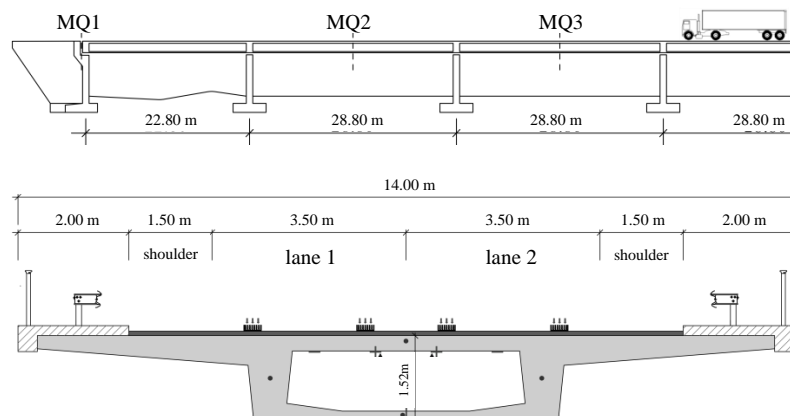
Bridge structure longitudinal section (above), cross section (below)
